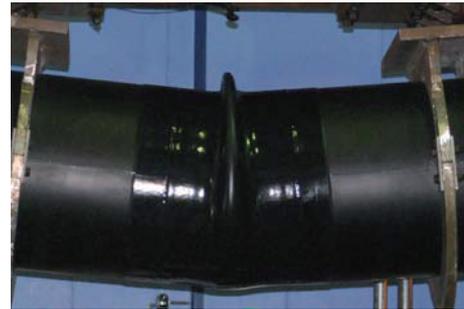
Deformation of test pipe at contact angle of inner wall ($\theta = 12.6^\circ$)
